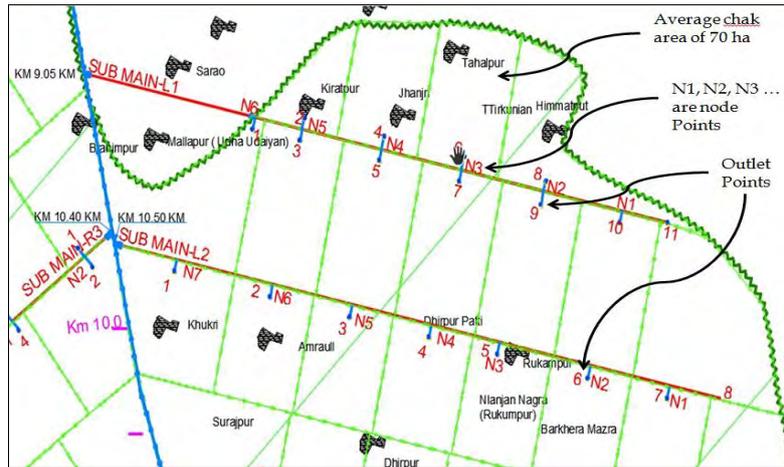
Layout plan of sub-main of Aonla Sprinkler Irrigation System.
